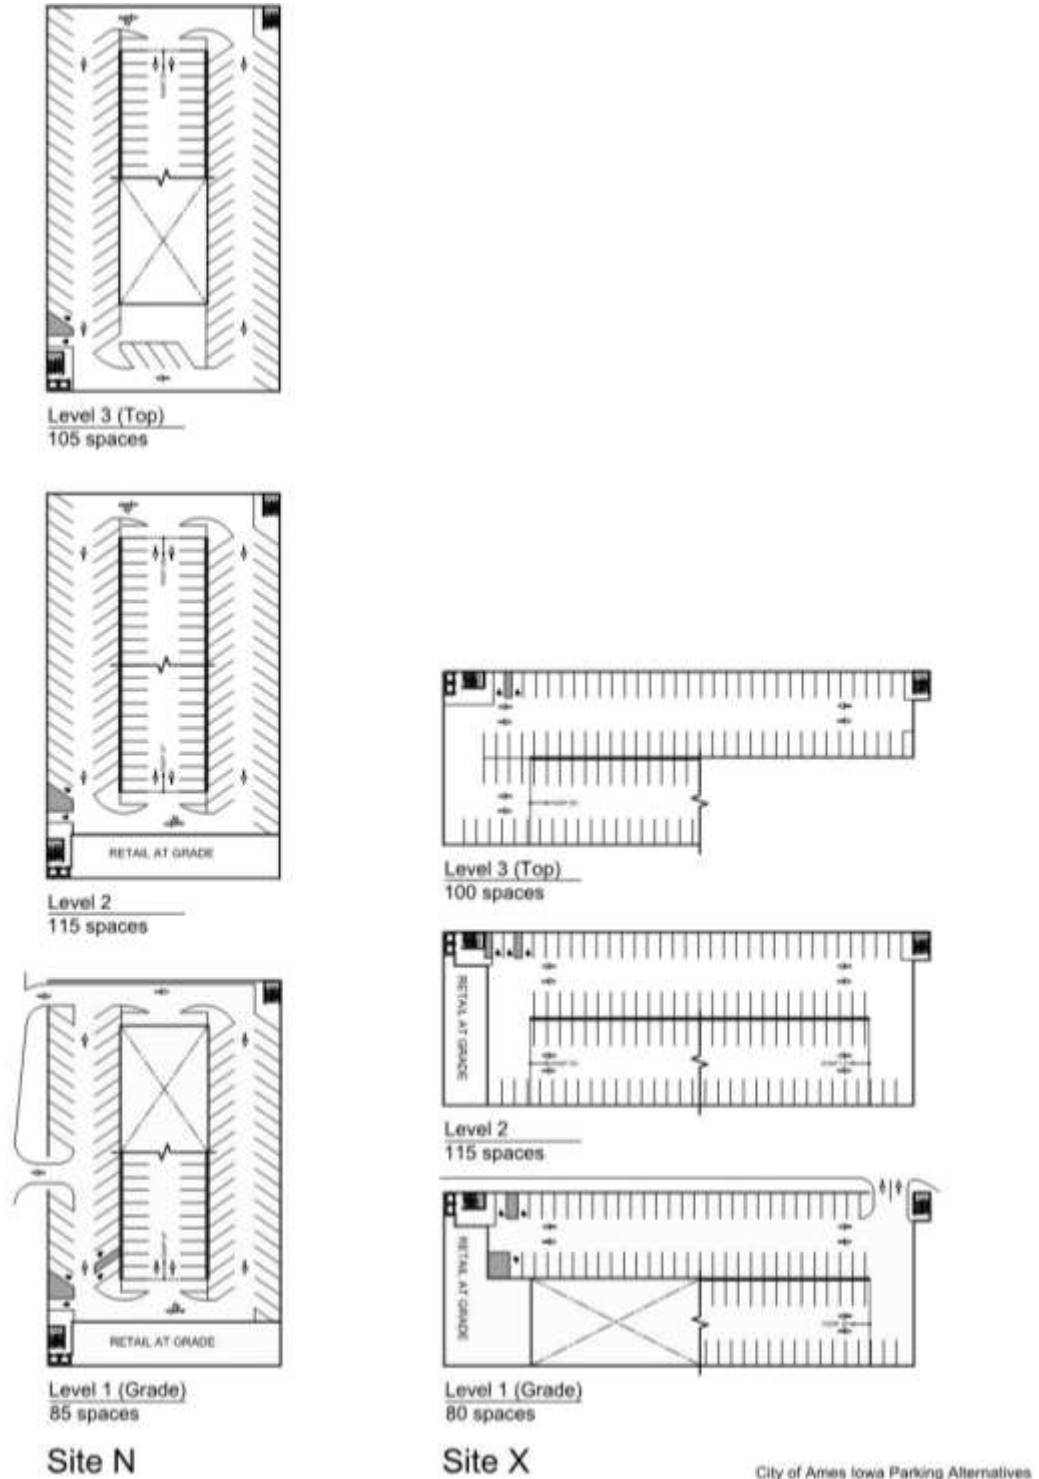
Site N and Site X – Parking Structure Conceptual Plan
